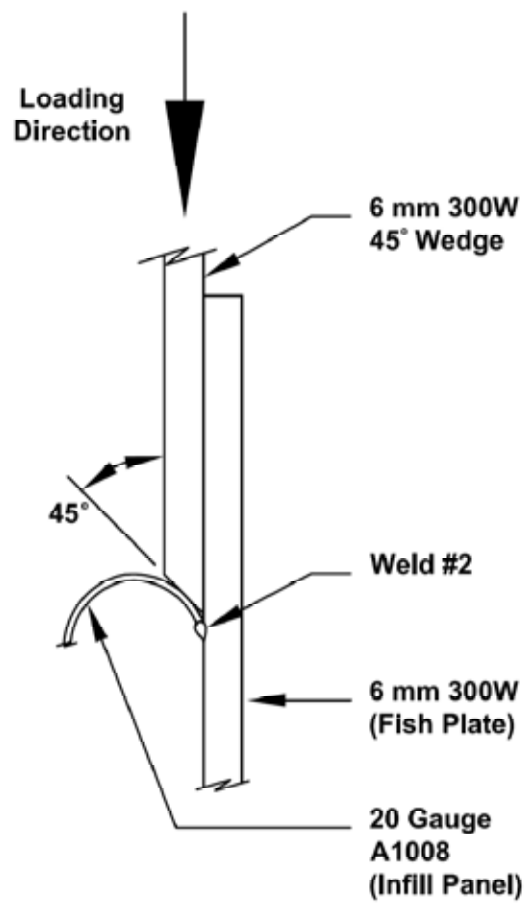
Side View of Wedge Push-Out Test of Weld #2
